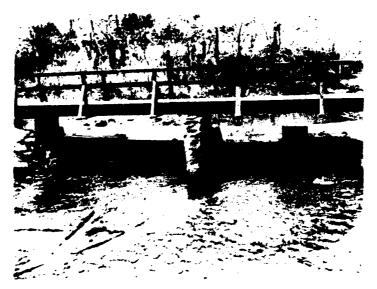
Combination foot bridge and road bridge at West End Neighborhood Center Camp obstructs floodflows.
